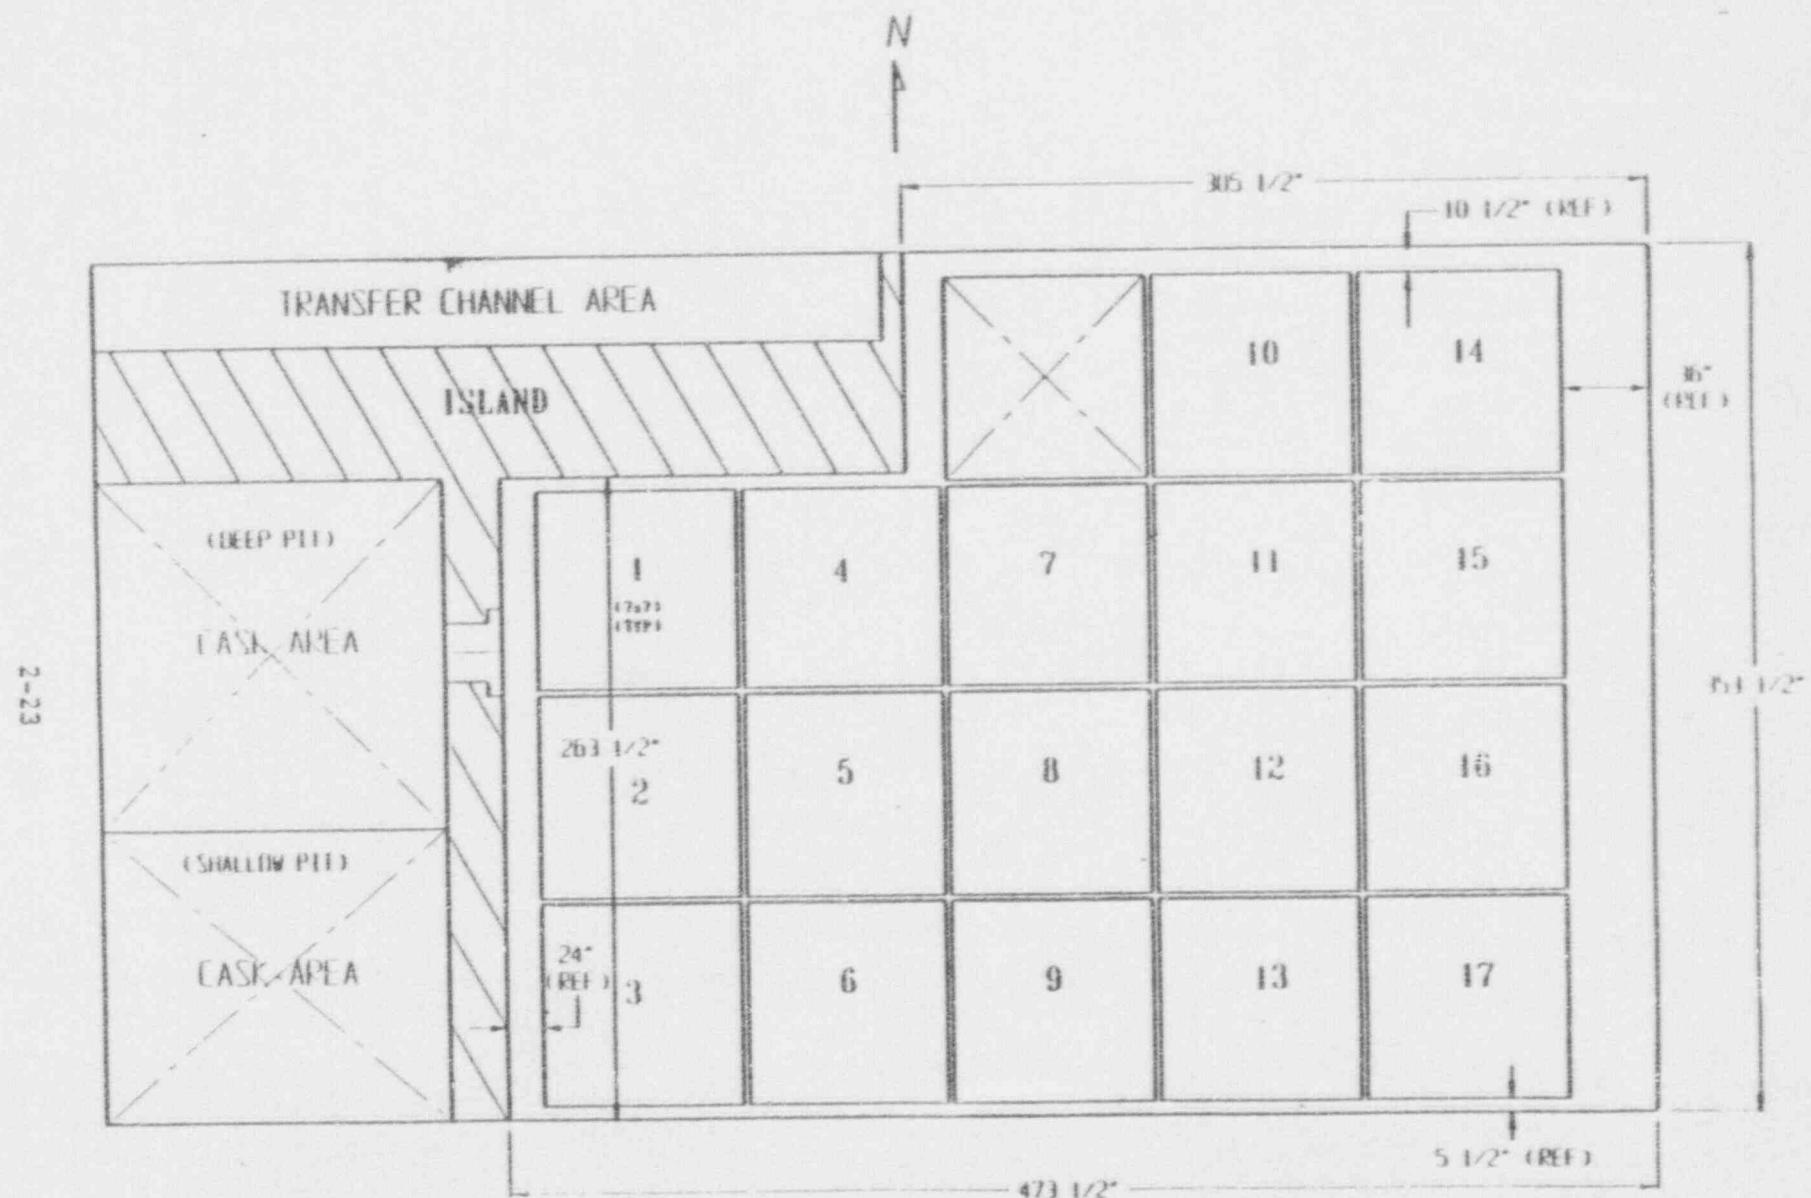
BEAVER VALLEY UNIT 1 EXISTING RACKS ARRANGEMENT
